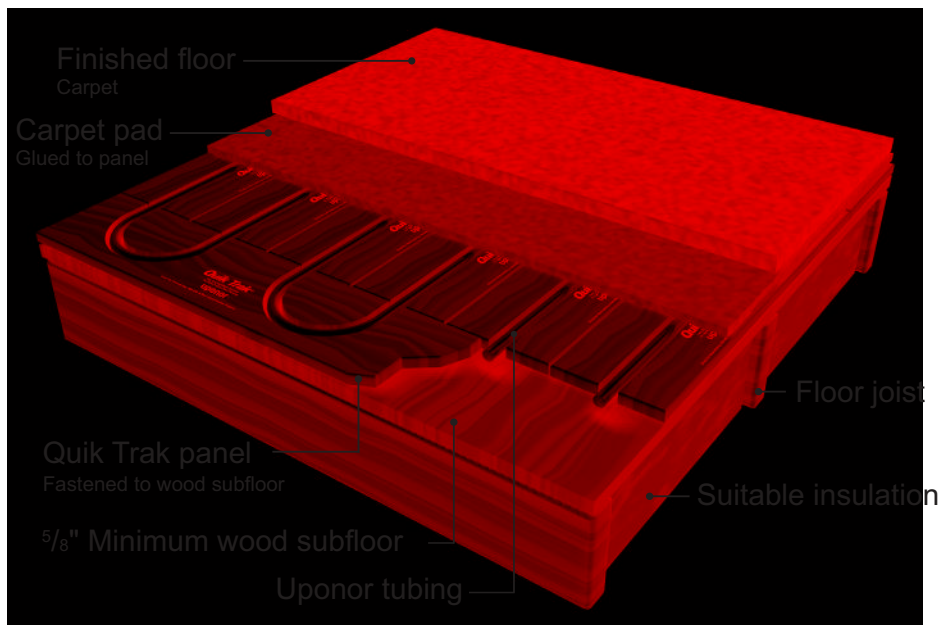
Quik Trak over a wood subfloor with carpet floor covering
